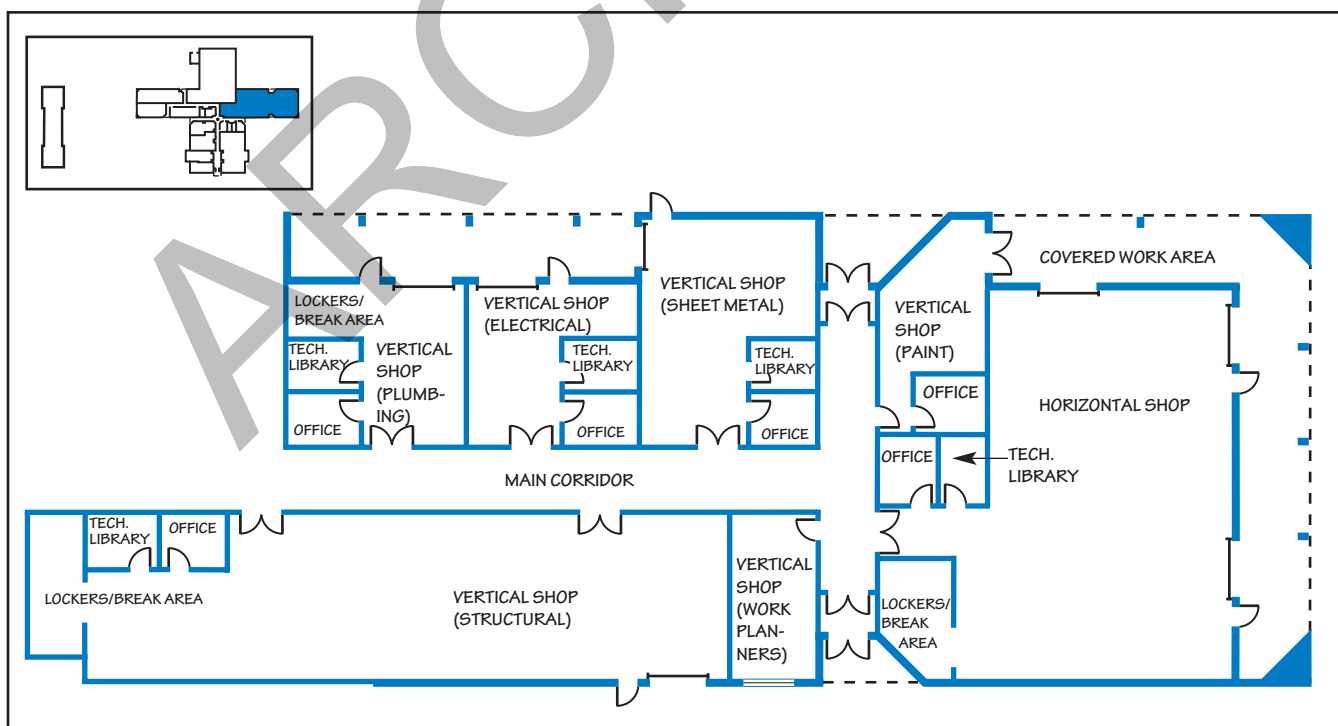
H: Heavy Repair Element Concept Floor Plan.
